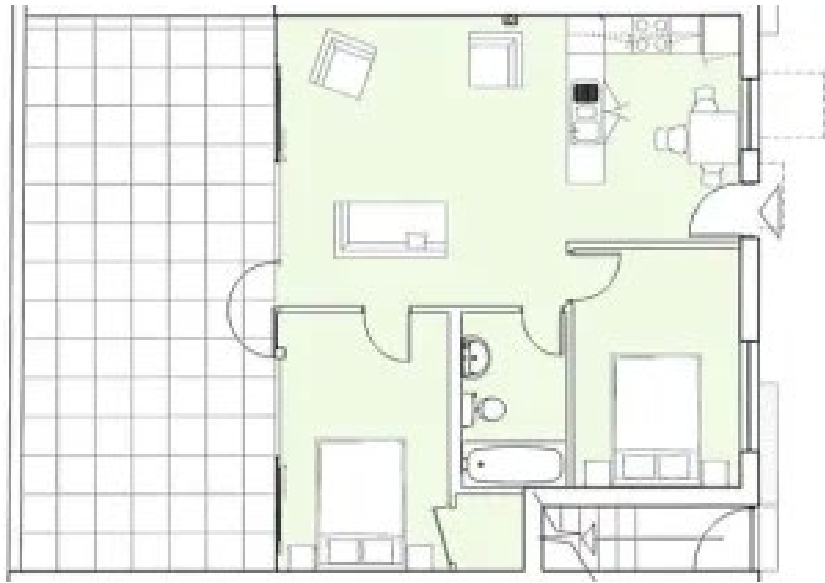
Donnybrook Quarter Floor plan of ground floor units
